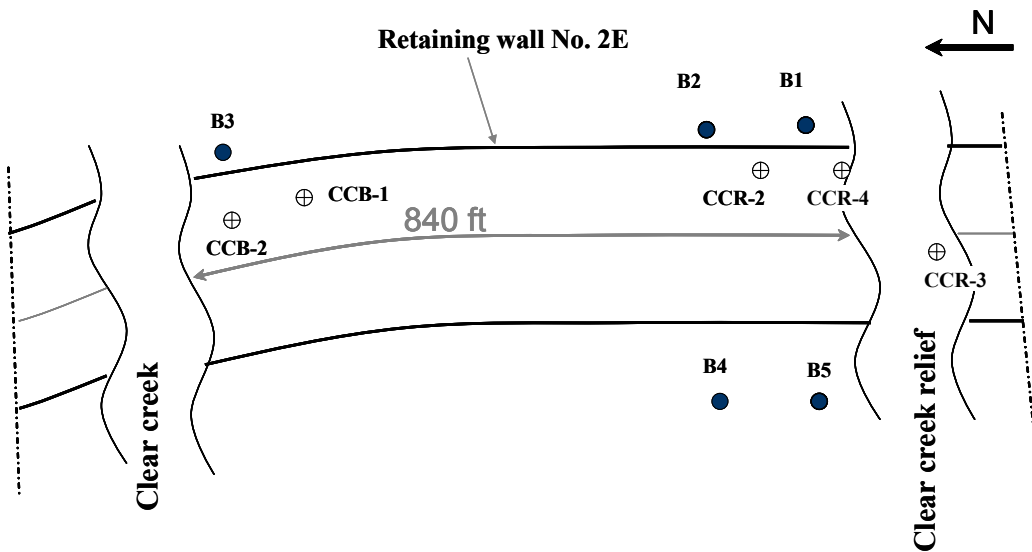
Location of the Borings Used in the Field (Drawings 13 and 14).
